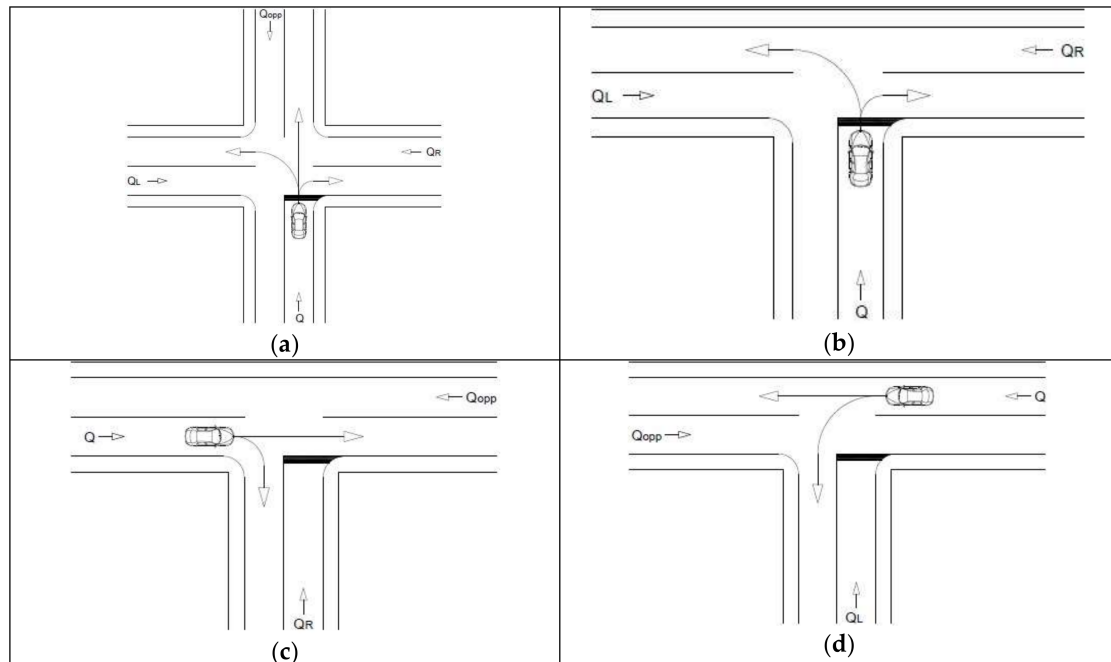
Examined layouts: (a) layout X1; (b) layout T1; (c) layout T2; (d) layout T3.
